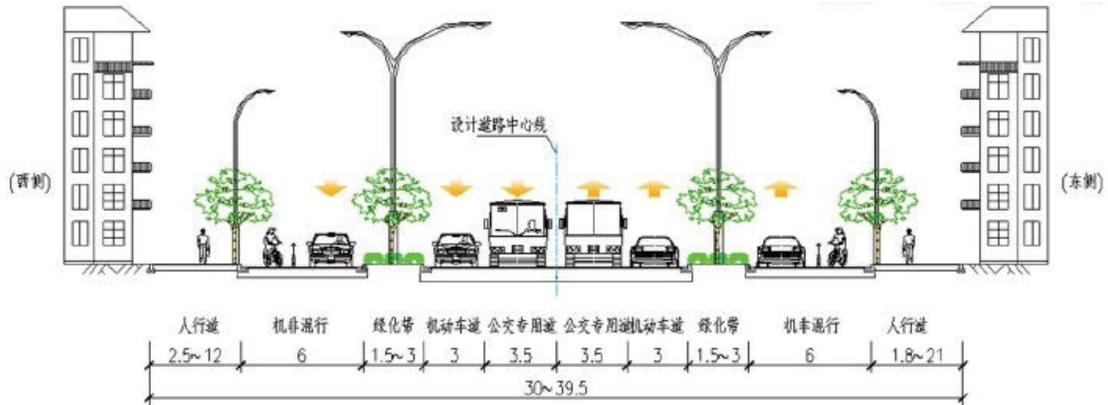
Profile design for Taihang Street □ Fuhou Street
